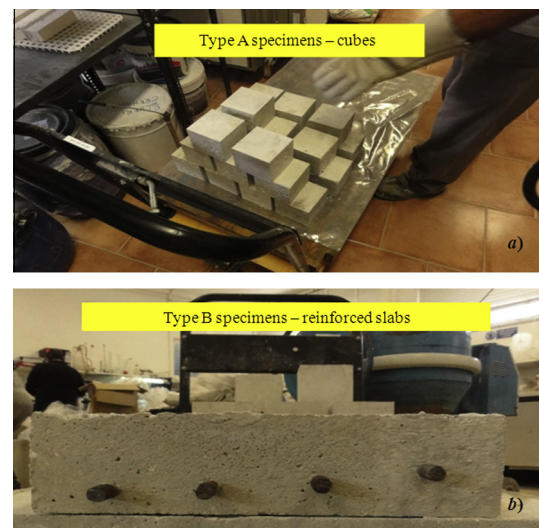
Casting of test specimens: (a) Type A specimens; and (b) Type B specimens.
